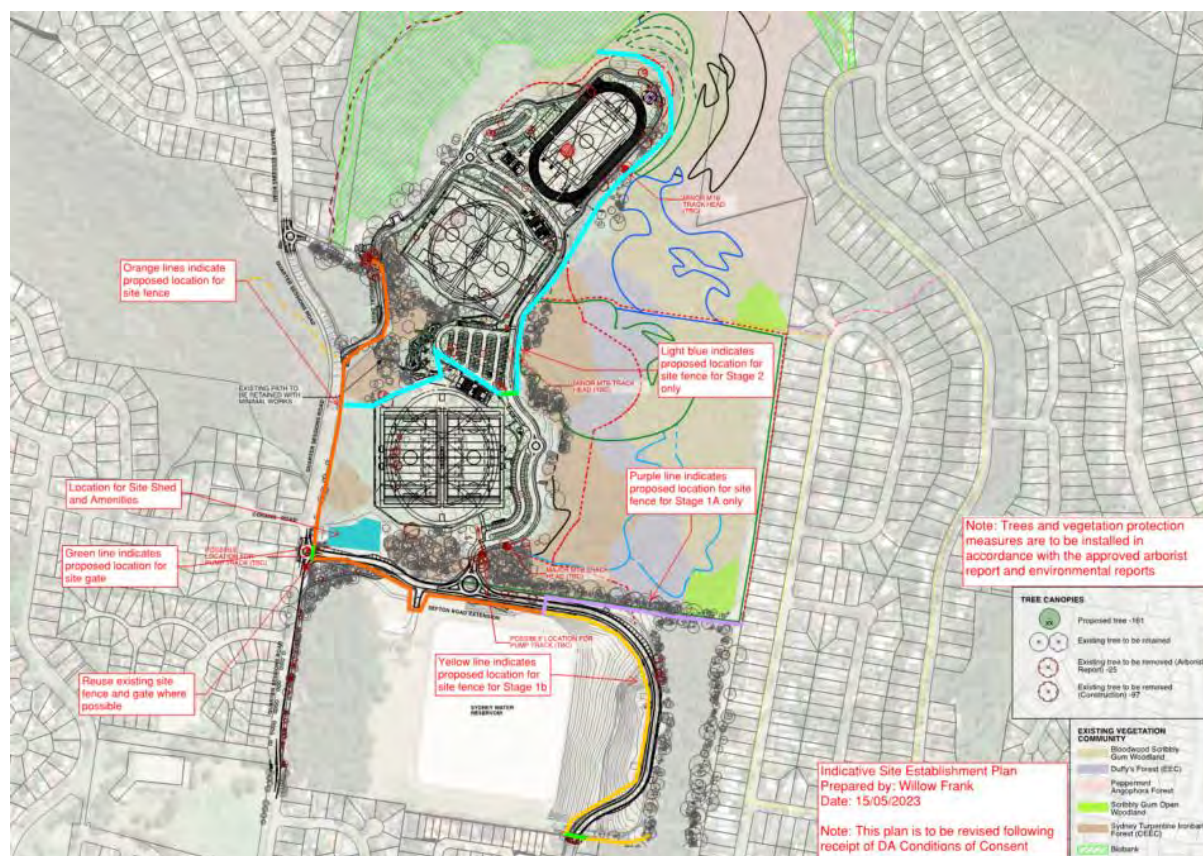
Site mark-up showing indicative locations for site fencing, site sheds, amenities etc.
